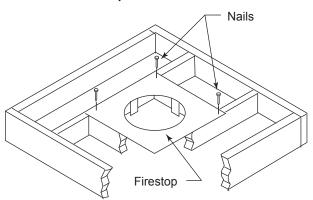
If Area Above is a Room, Install Firestop above Framed Hole as Shown
